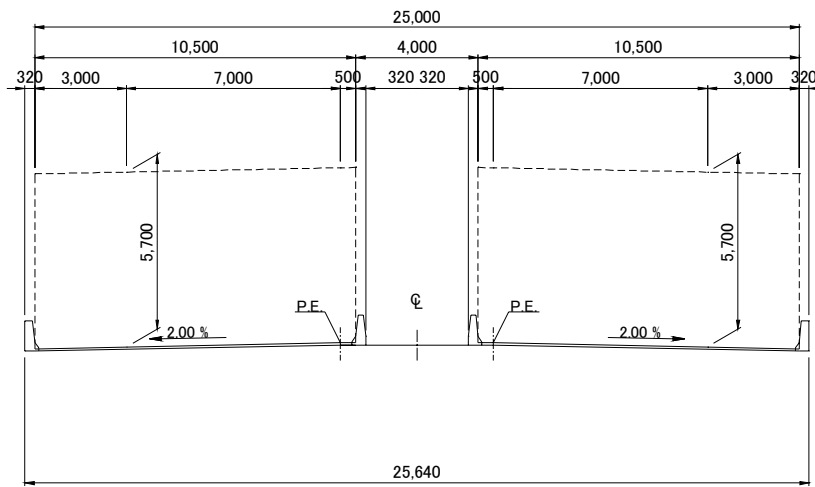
Typical Cross Section for Main Bridge at Initial Stage
